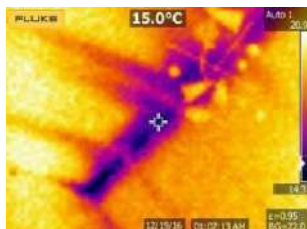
shows a bedroom roof apex is cold at the join of the two roof sections.
